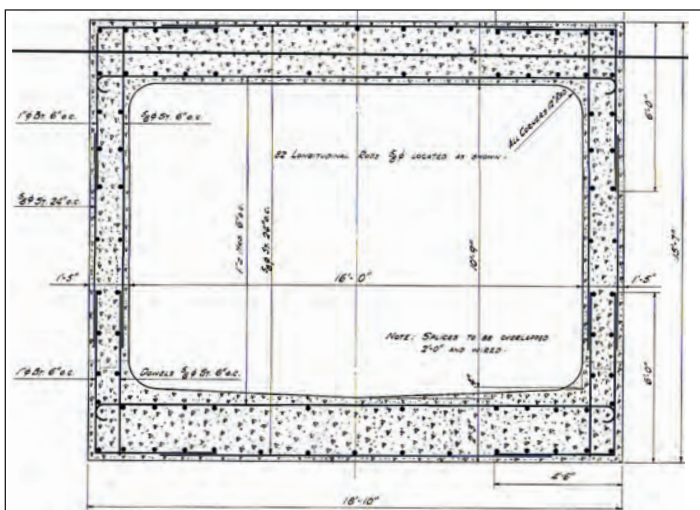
Cross-section of the Smith Street Drain. Buffalo Sewer Authority
